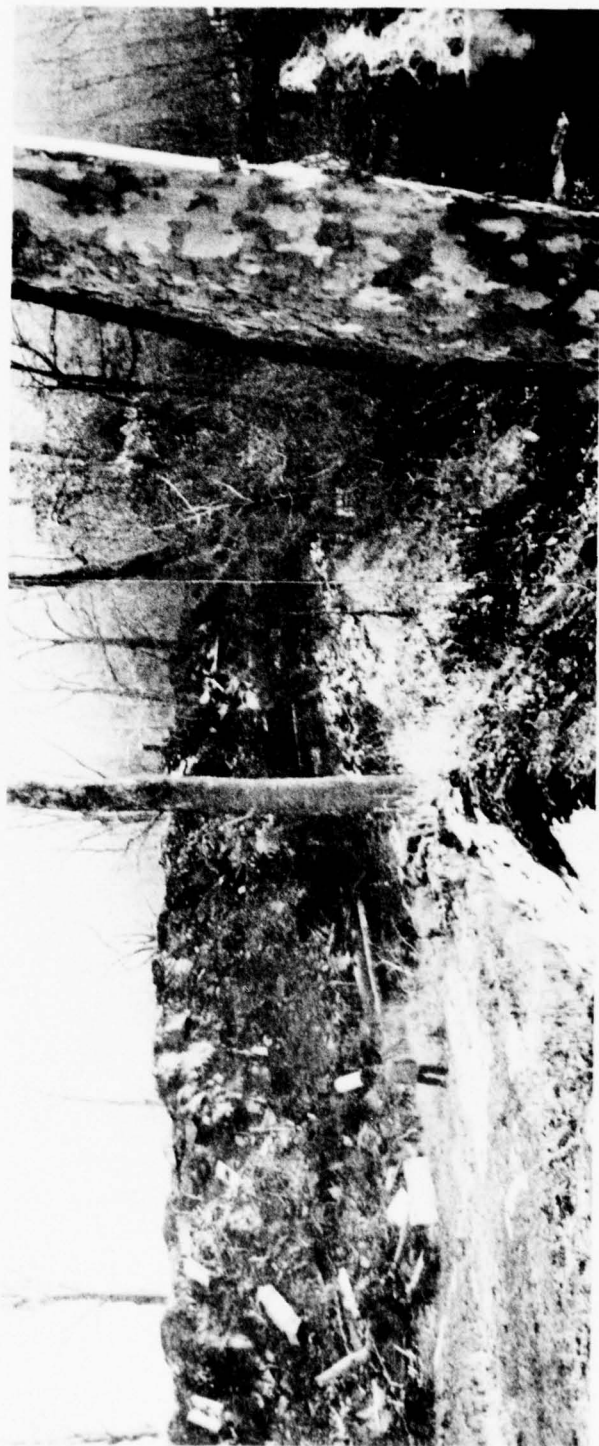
View looking towards the downstream left abutment of dam showing mixed fill, spillway diversion dike and spillway channel.
